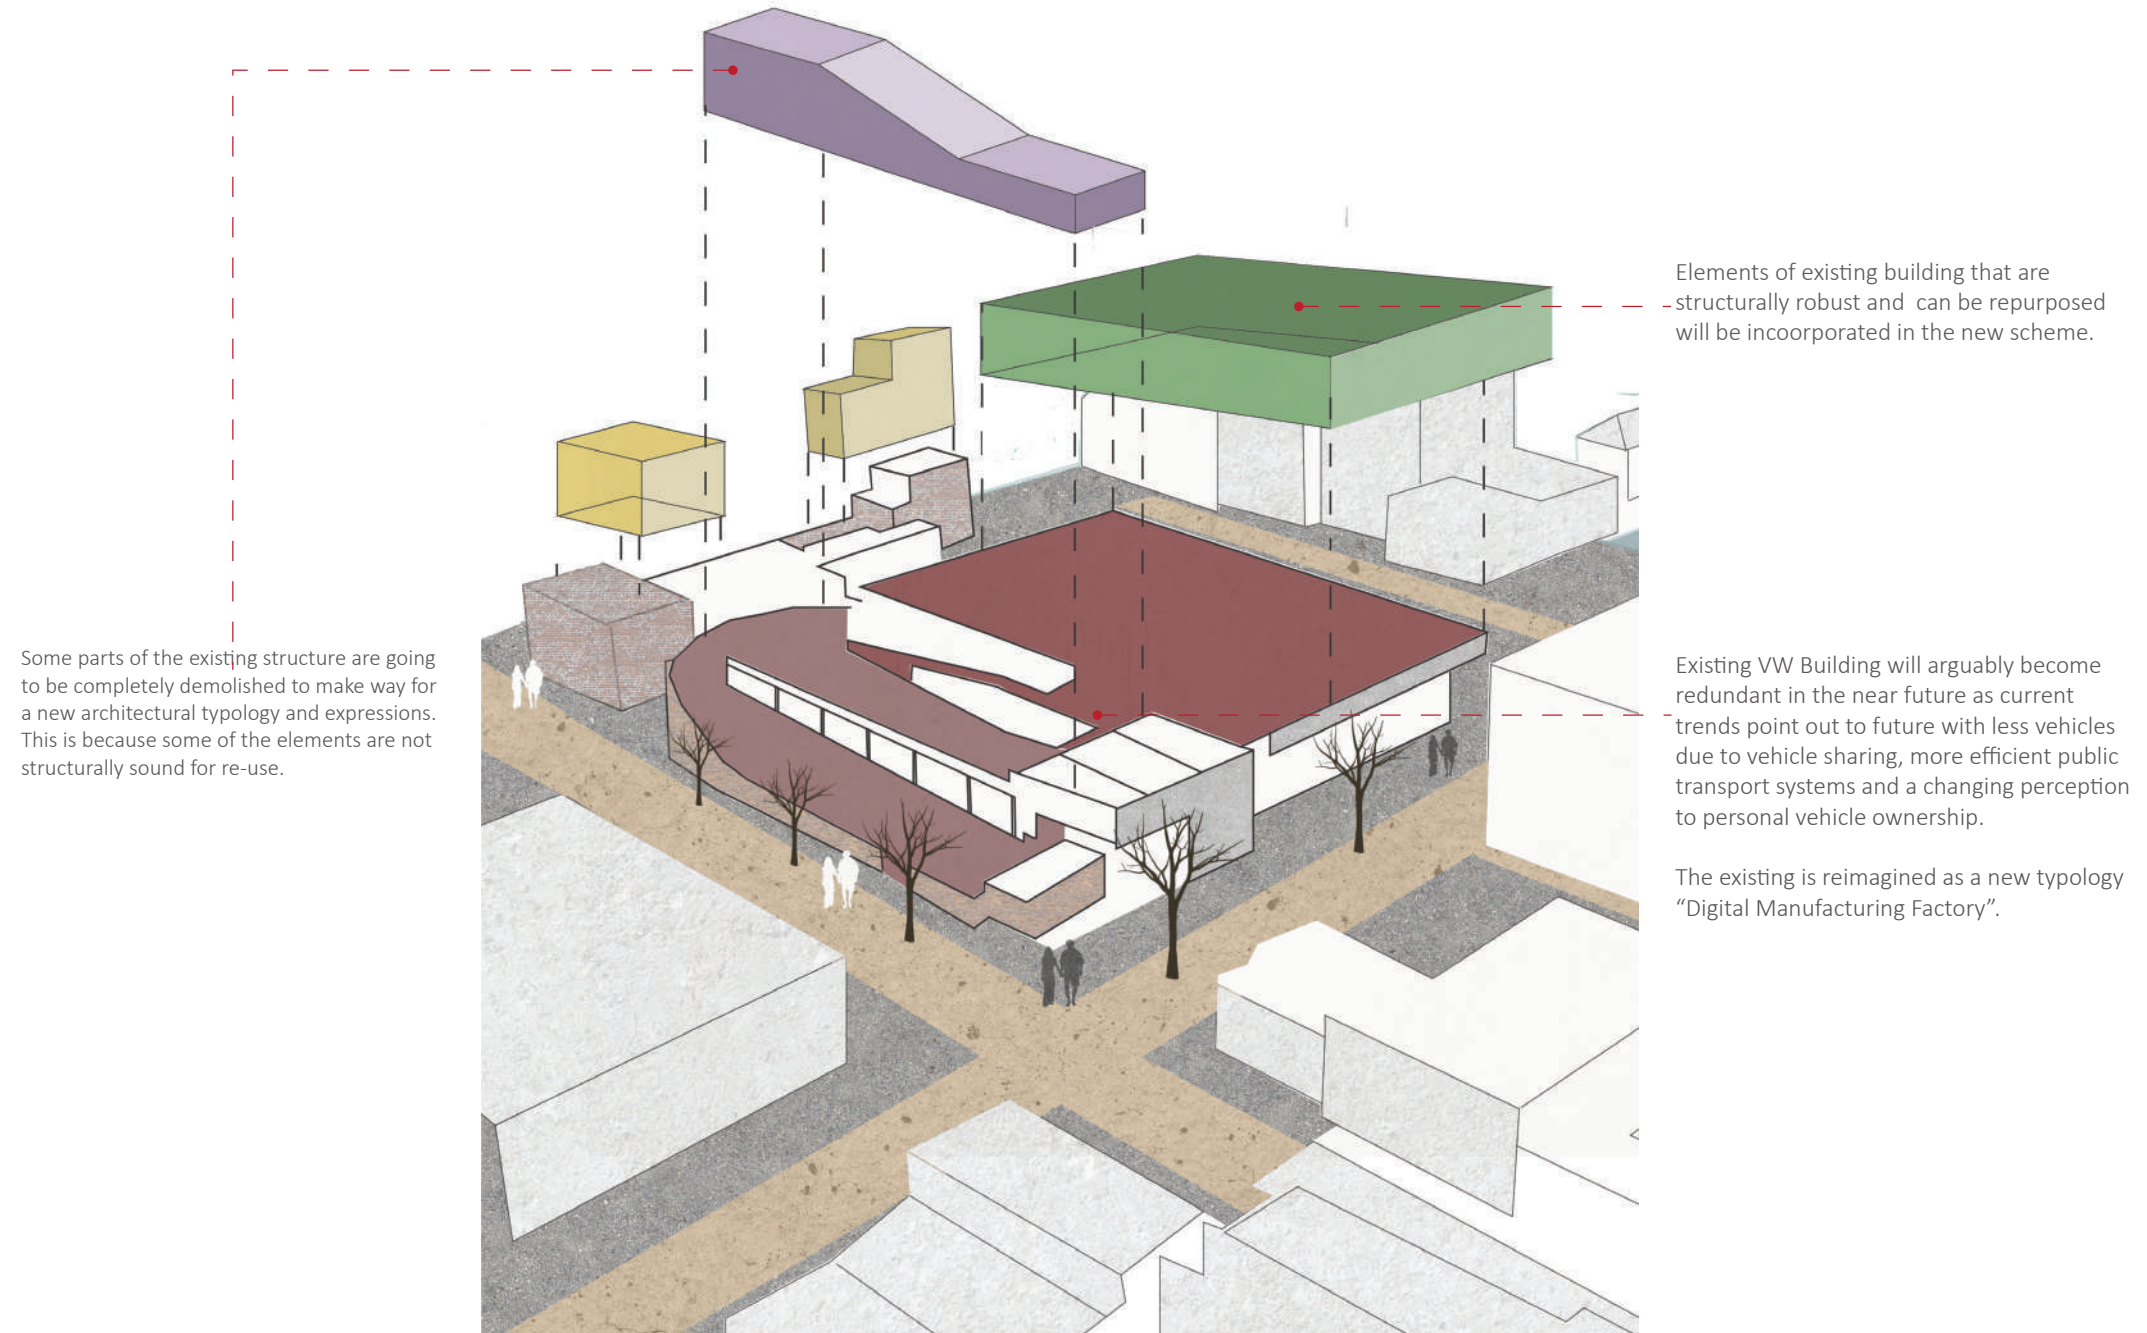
(iii):Diagram Analysing Existing Building and Proposed Site Strategy, (Author 2020).
